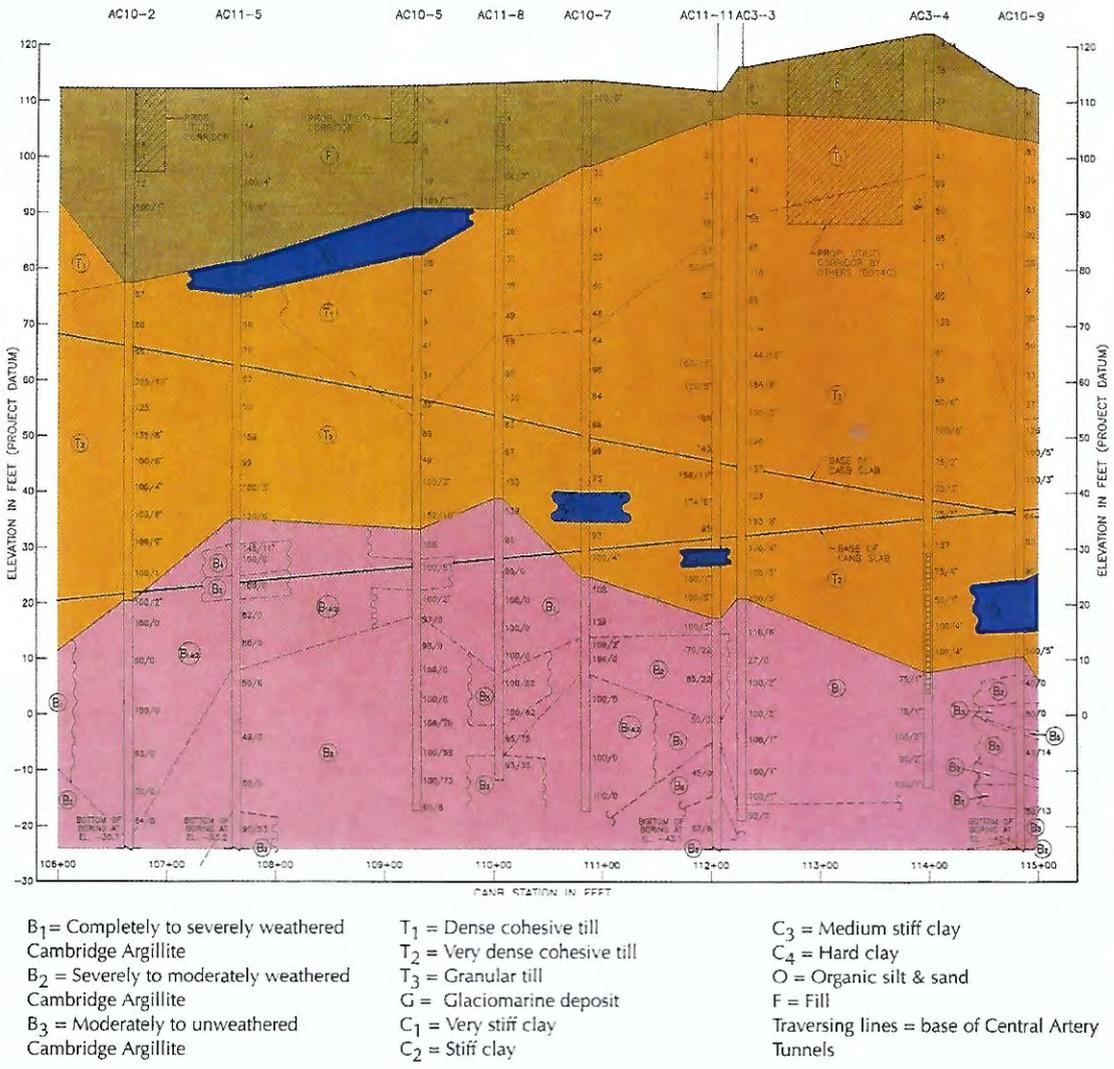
Section along the Central Artery Tunnel from Congress Street to Fleet Center near the Charles River, middle slurry wall between Stations 106+00 and 115+00 (view west to southwest).
